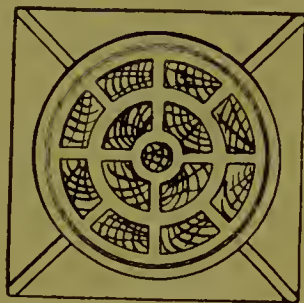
Manhole Cover with Hard Wood Blocks.
